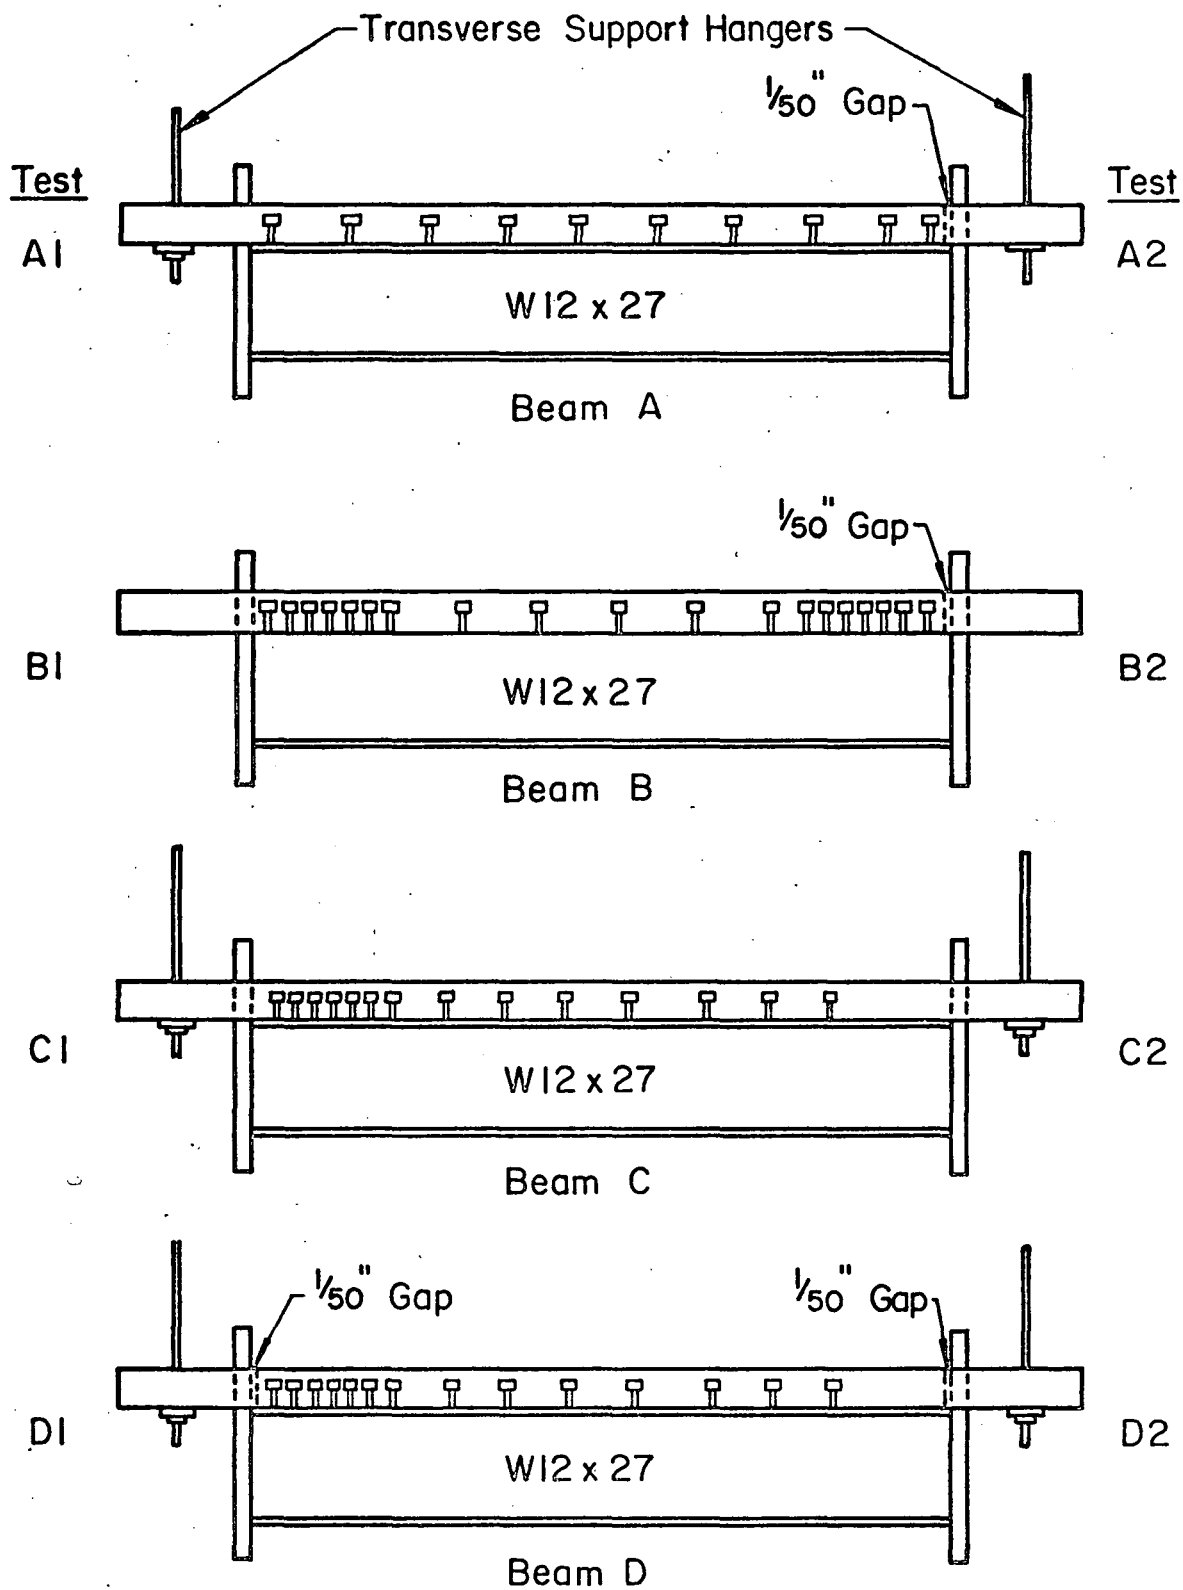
DETAIL OF TEST BEAMS A, B, C & D
